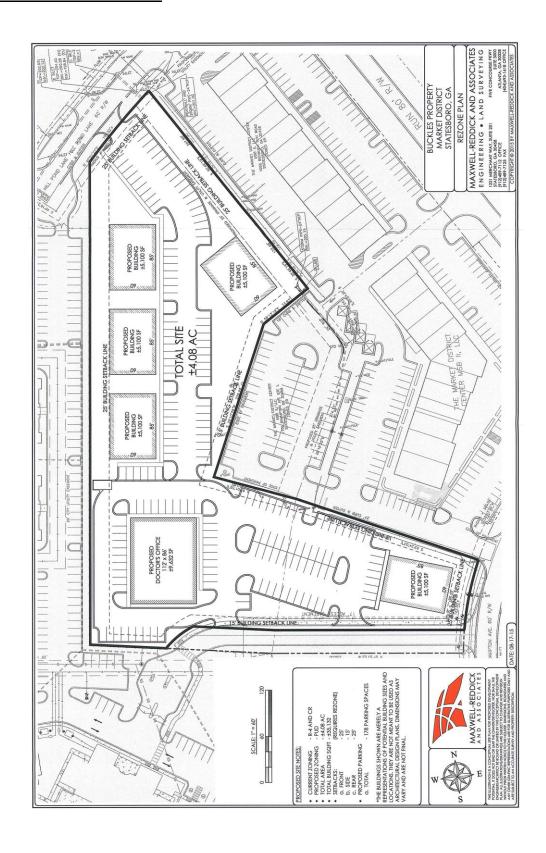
EXHIBIT C: PROPOSED INTERIOR CONCEPT PLAN
